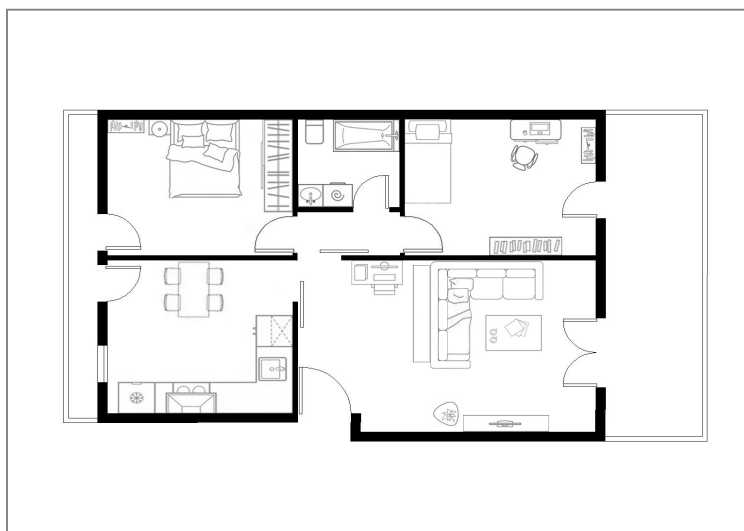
Floor plan of Eleni's apartment (Ioanna Barkouta)
